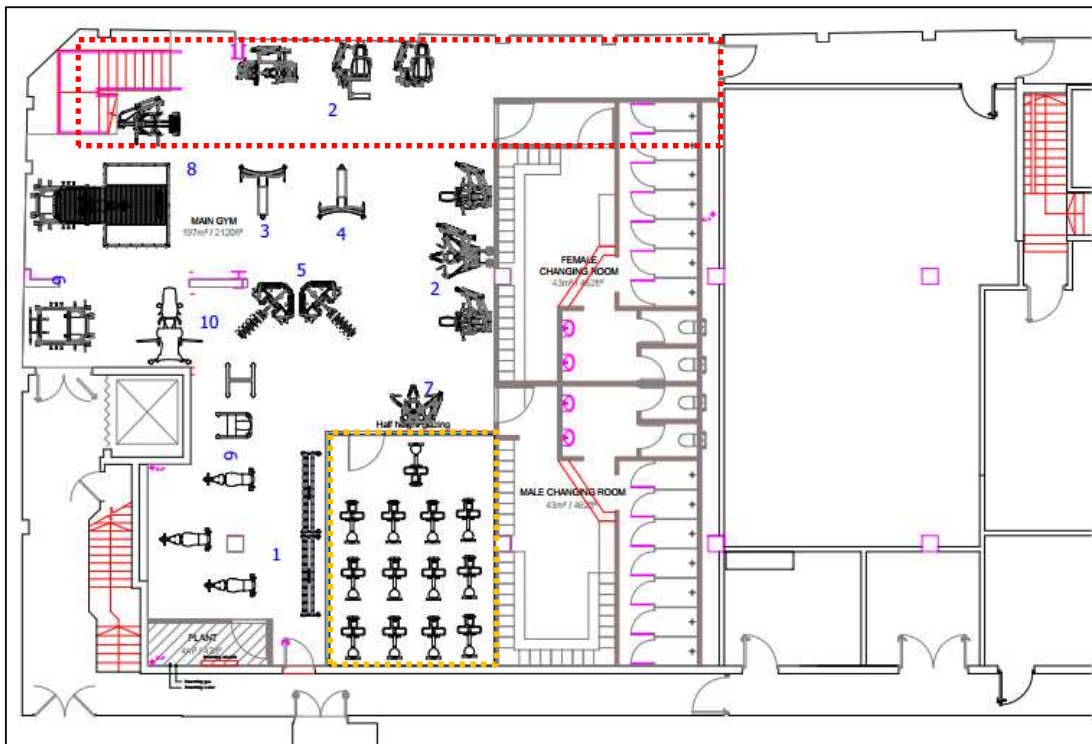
Indicative Drawing of the proposed Basement Floor gym space
